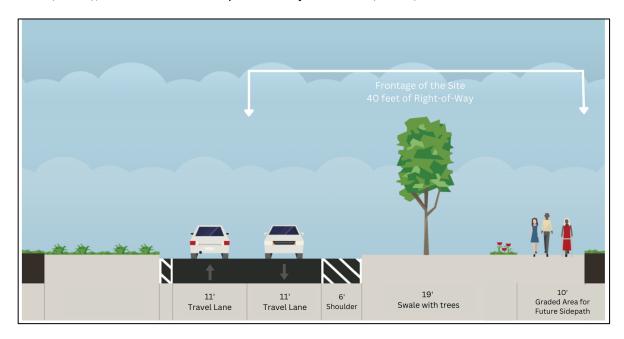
Proposed cross-section for Ednor Road, as conditioned.
